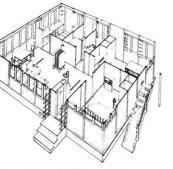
Interlocking wall, floor, and roof panel assembly.
